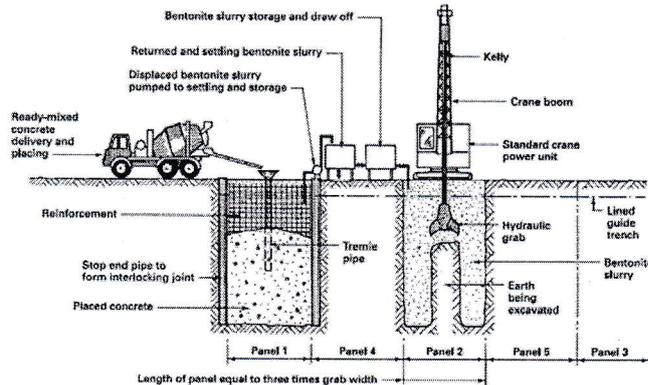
Diaphragm wall construction: bentonite slurry method
